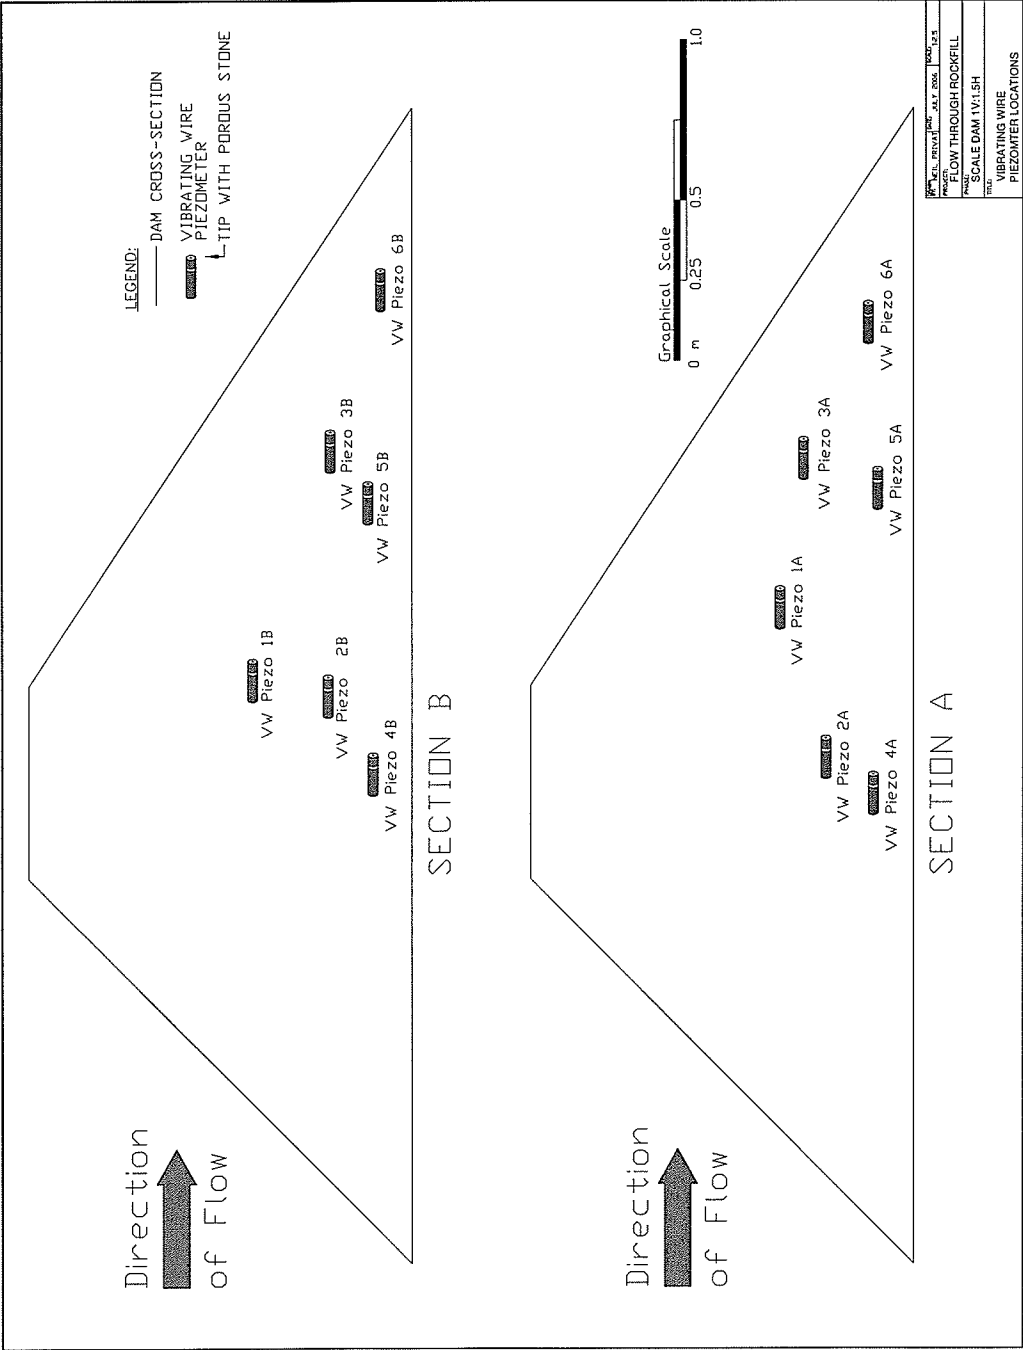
Scale Dam 1V:1.5H, Cross-section with Locations of Vibrating Wire Piezometers
